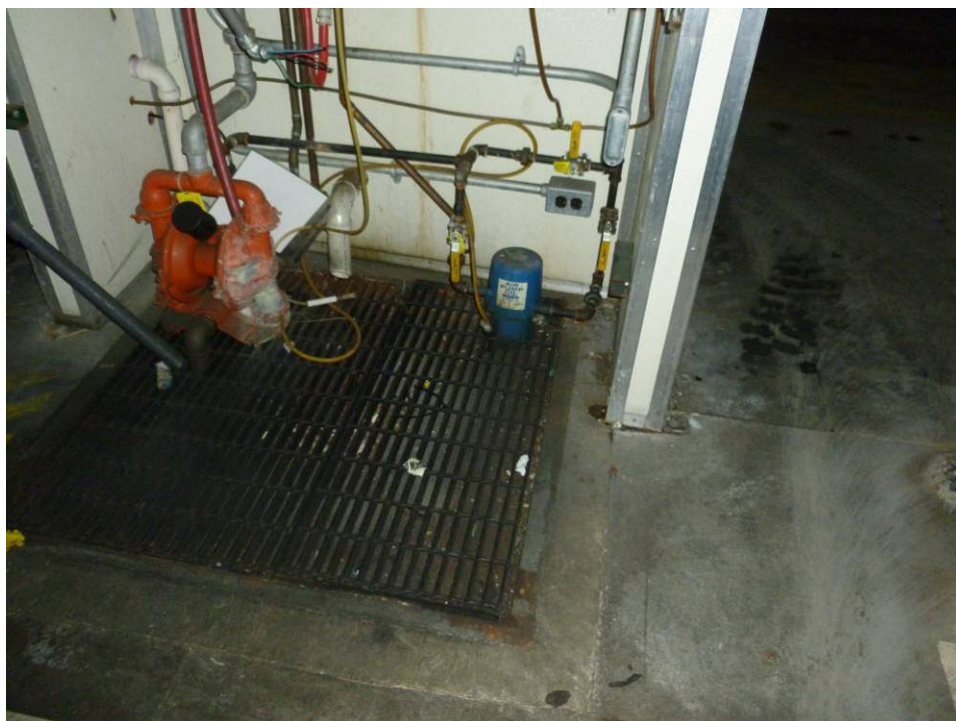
(AOI-24) Green dock exterior. Photo taken facing east.
